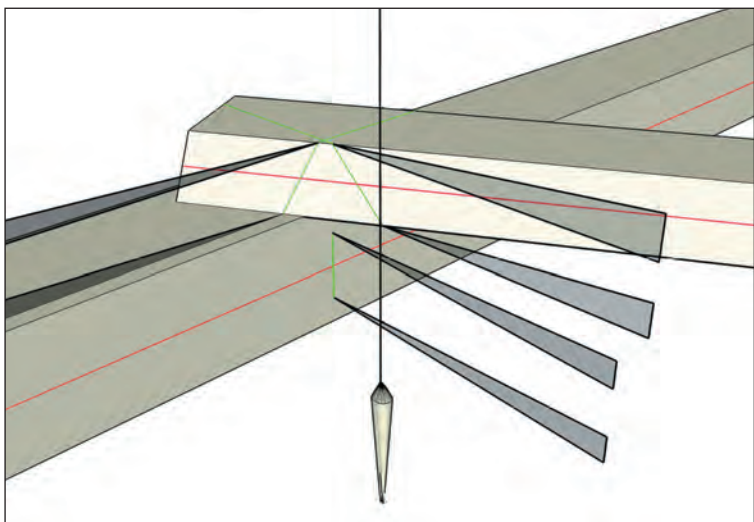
Marking brace for bearing end of tenon. Pencil must be perpendicular to face of post since bearing housing is plumb to surface.
